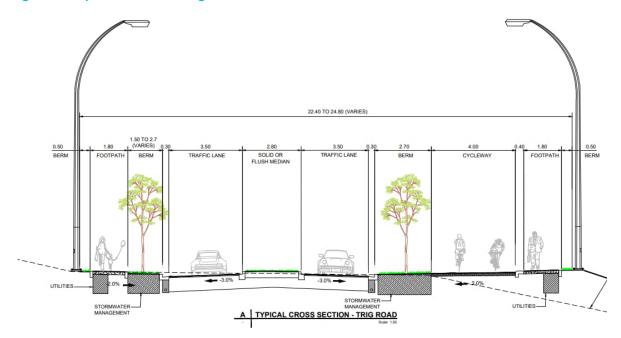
Whenuapai – Trig Road Corridor Upgrade
